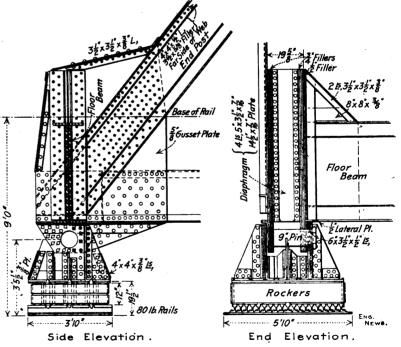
DETAILS OF THE EXPANSION BEARING OF 202-FT. TRUSS SPAN OF THE NEW CLINTON BRIDGE; CHICAGO & NORTH-WESTERN RY.
